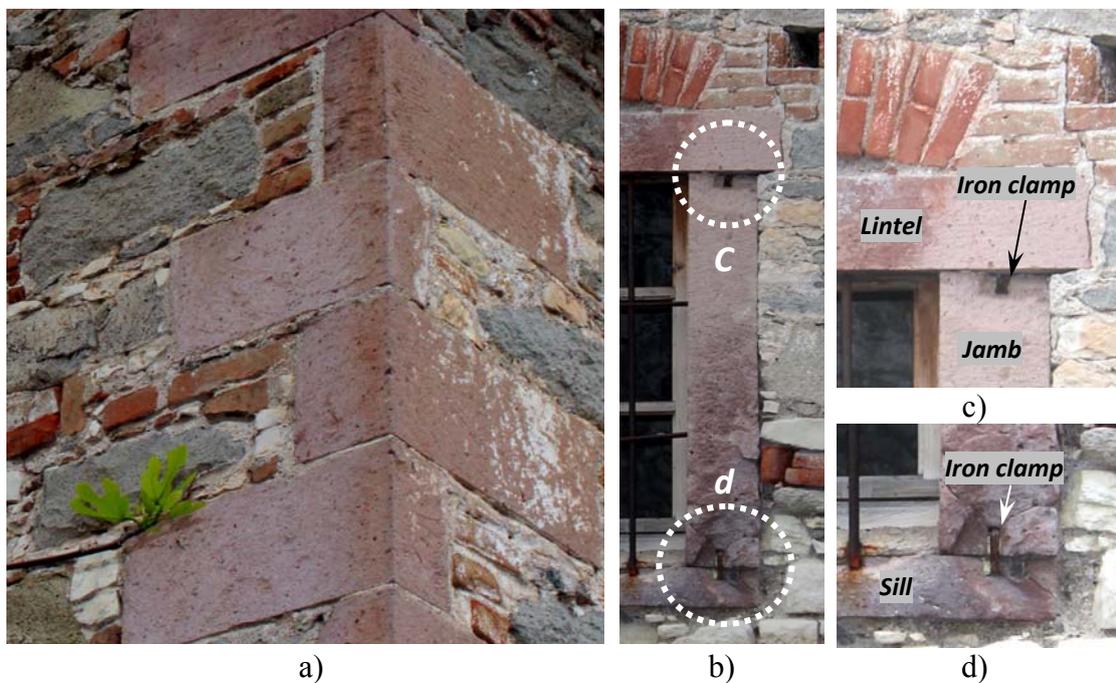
a) Detail of a quoin and masonry pattern, b) the edge of a typical window, c) the connection of lintel and jamb, d) jamb and sill
